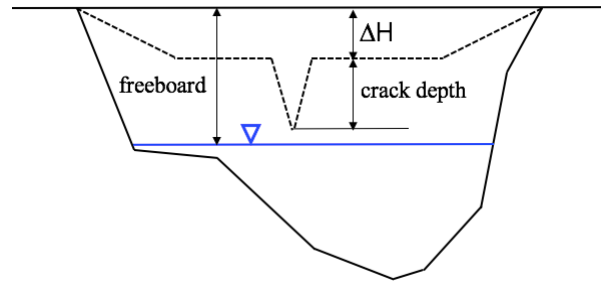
Elevation of crack bottom and reservoir water level [12]
